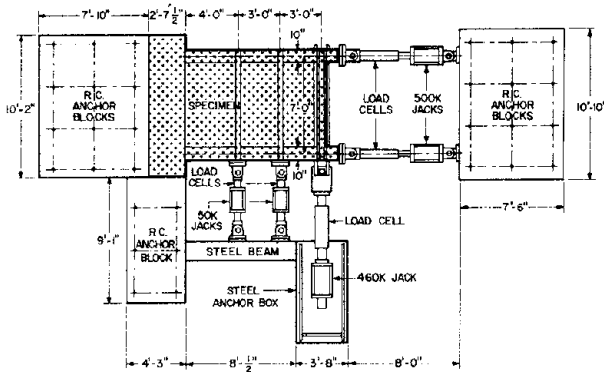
PLAN AND GENERAL VIEW OF TESTING FACILITY
